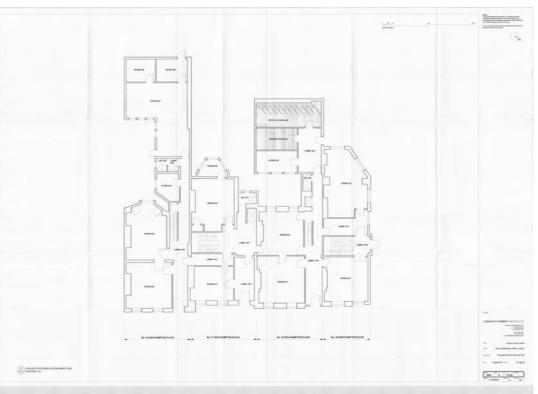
(Above, Left) - Basement Floor Plan, as Proposed (Canaway Fleming Architects, 2010).
